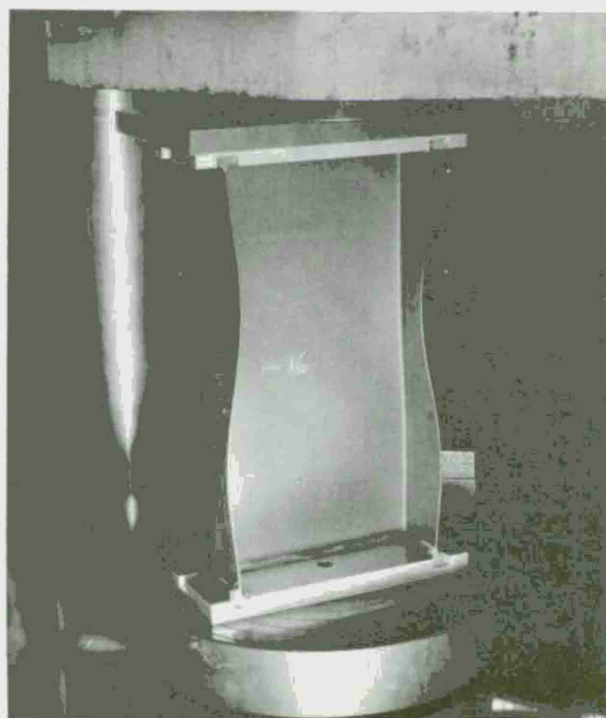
Compression post buckling of channel specimen 16-3 at 7,750-lb load.
